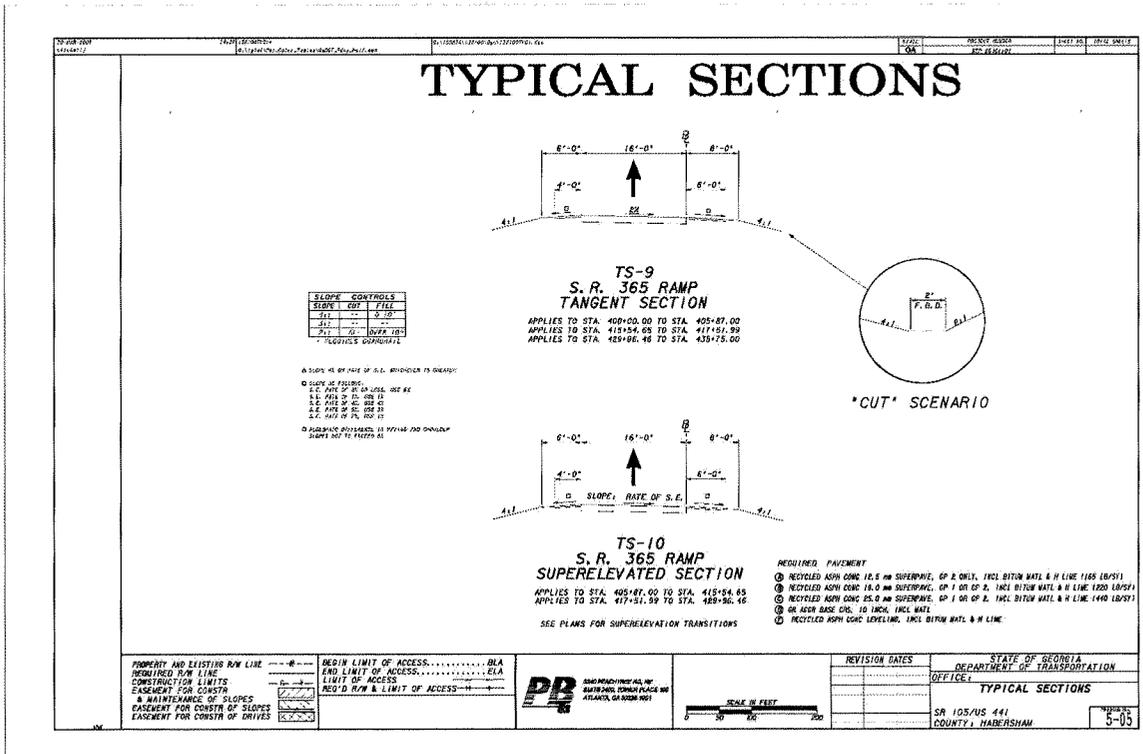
Typical Sections, SR 365 at Exit/Entrance Ramps
